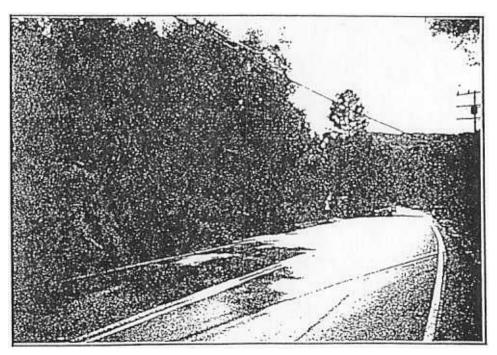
The Topanga Pipeline Investigation. View to the south from UTM location Zone 11, 352531 meters Easting, 3774329 meters Northing showing land use adjacent to Topanga Canyon Boulevard.
